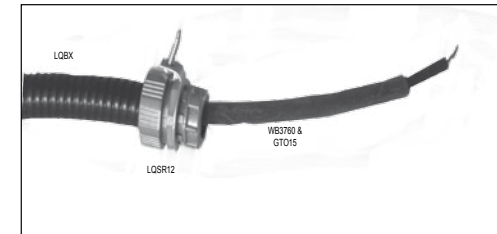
Slide USSB over WB3760 and GTO cable.. If necessary, Slide support ring over assembly and use metallic self tapping screw to hold assembly in place on wall or ceiling.
